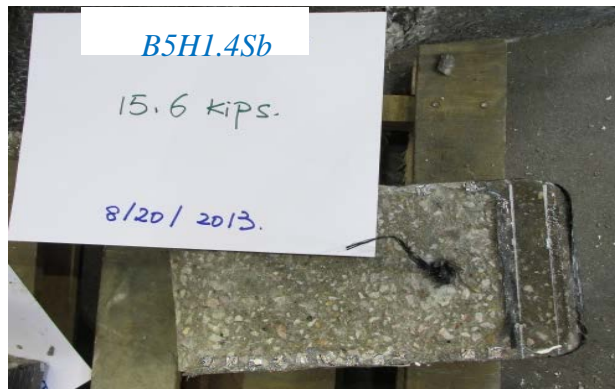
Anchor rupture of beam B5H1.4Sb
